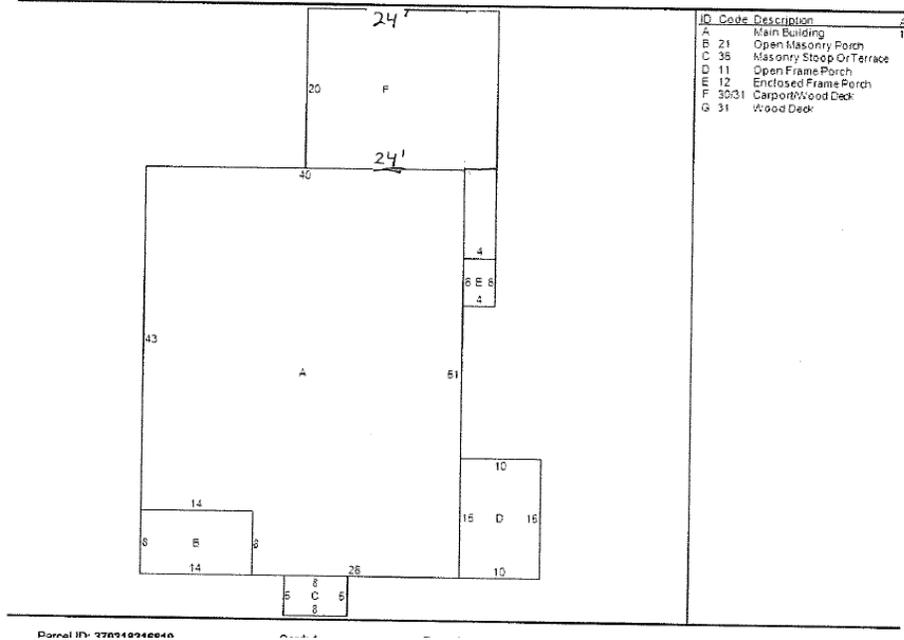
Applicant provided site. Note the setup will slightly differ, but the footprint will be unchanged.
